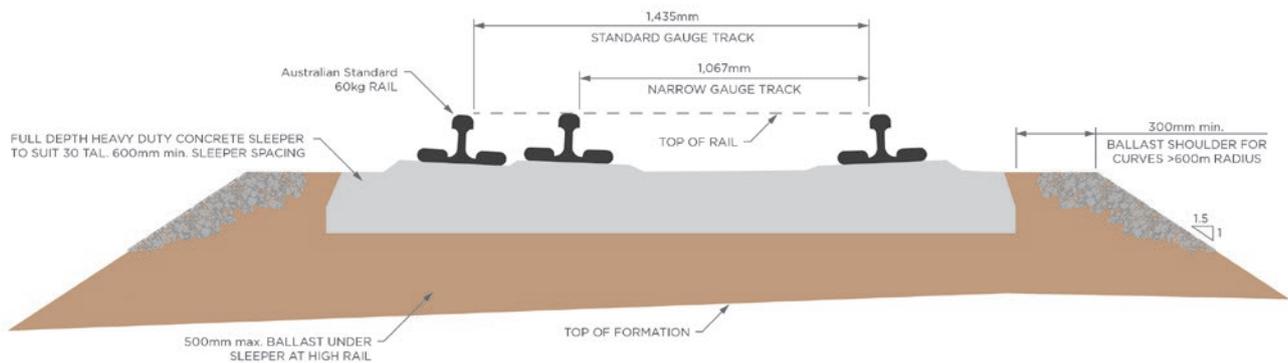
INDICATIVE DESIGN FOR NEW TRACK
